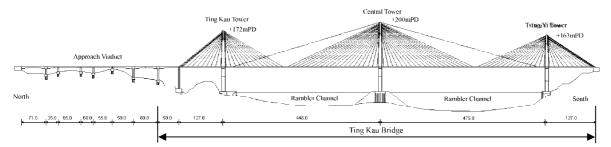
Elevation of Ting Kau Bridge and approach viaduct (dimensions in m)
